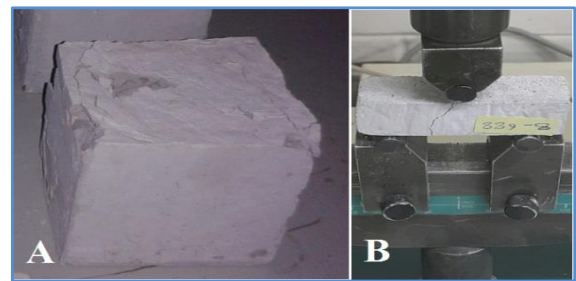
The specimens after testing: (A) concrete cubes (100x100x100) mm for compressive strength, and (B) concrete prisms (20x20x70) mm for flexural strength.
